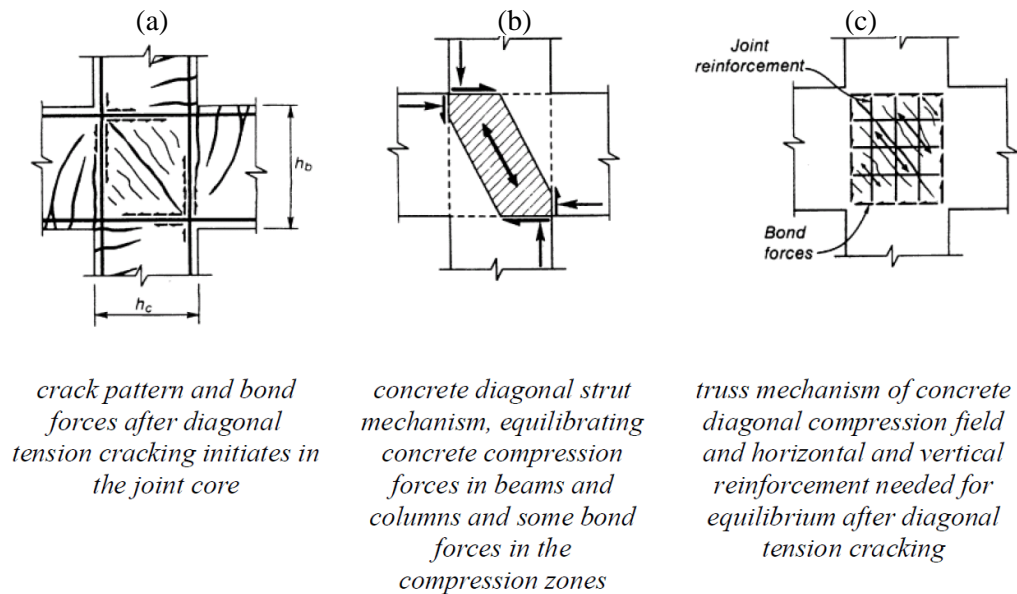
Interior beam-column joint crack patterns (a) and strut and tie mechanism (b) and (c) (adapted from Hakuto et al., 2000).
